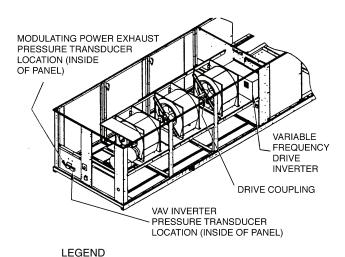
Pressure Transducer Locations (48AJ,AK,AW,AY060 and 48EJ,EK,EW,EY054-068)
